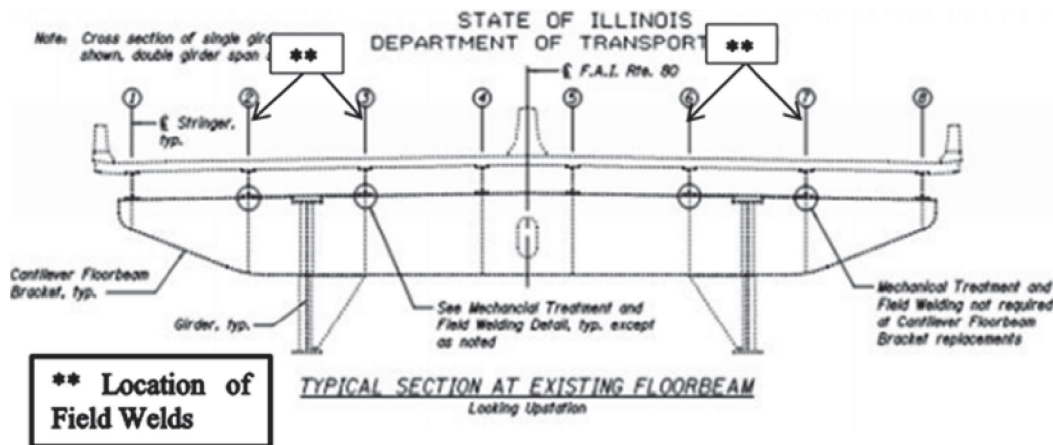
Illinois DOT locations of field welding for out-of-plane cracking.
